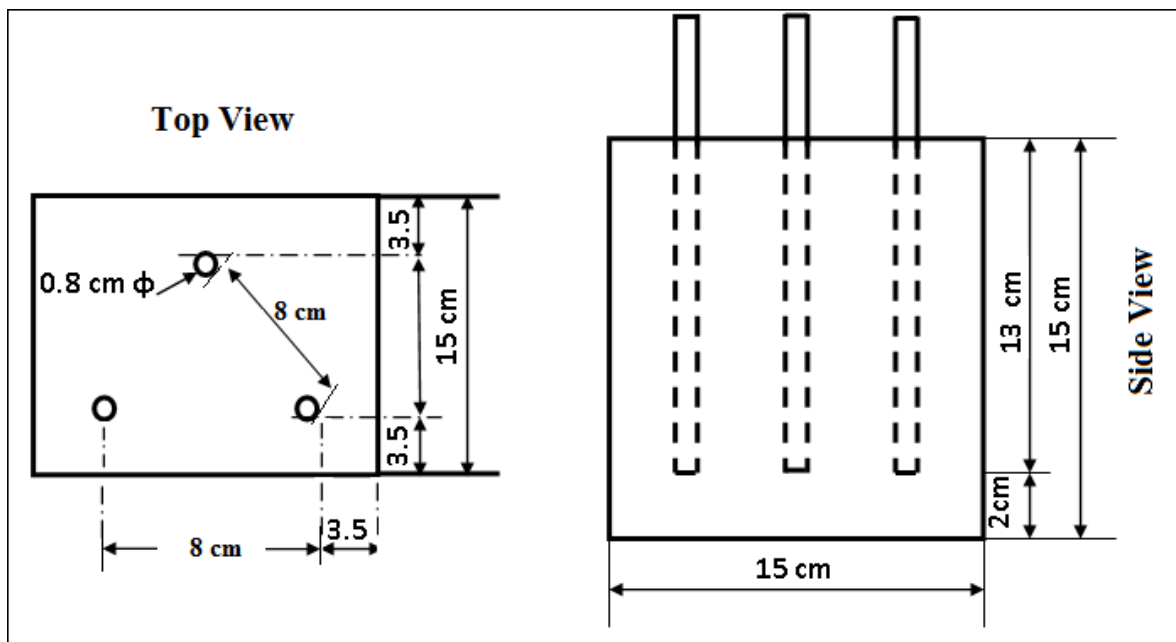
Details of reinforced concrete specimen for electrical resistivity test
